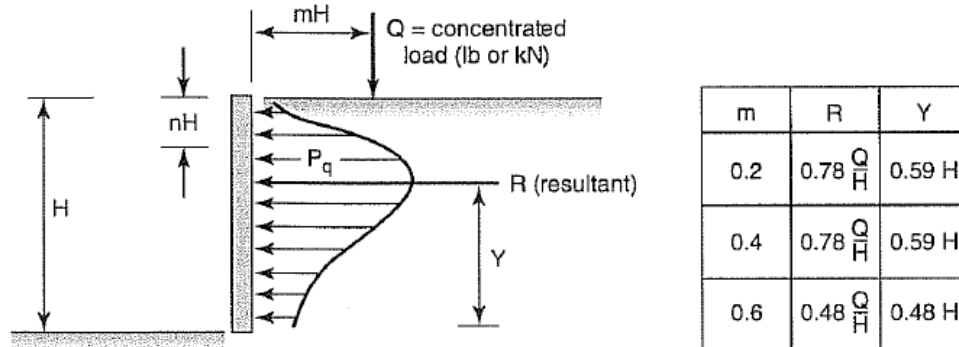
Pressure distribution against vertical wall resulting from point load,  $Q$ .
